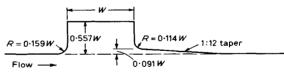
Typical gate slot with downstream offset to minimize cavitation. (After US Army Corps of Engineers (1952–70) *Hydraulic design criteria*. US Army Engineer Waterways Experiment Station, Vicksburg, Mississippi)
